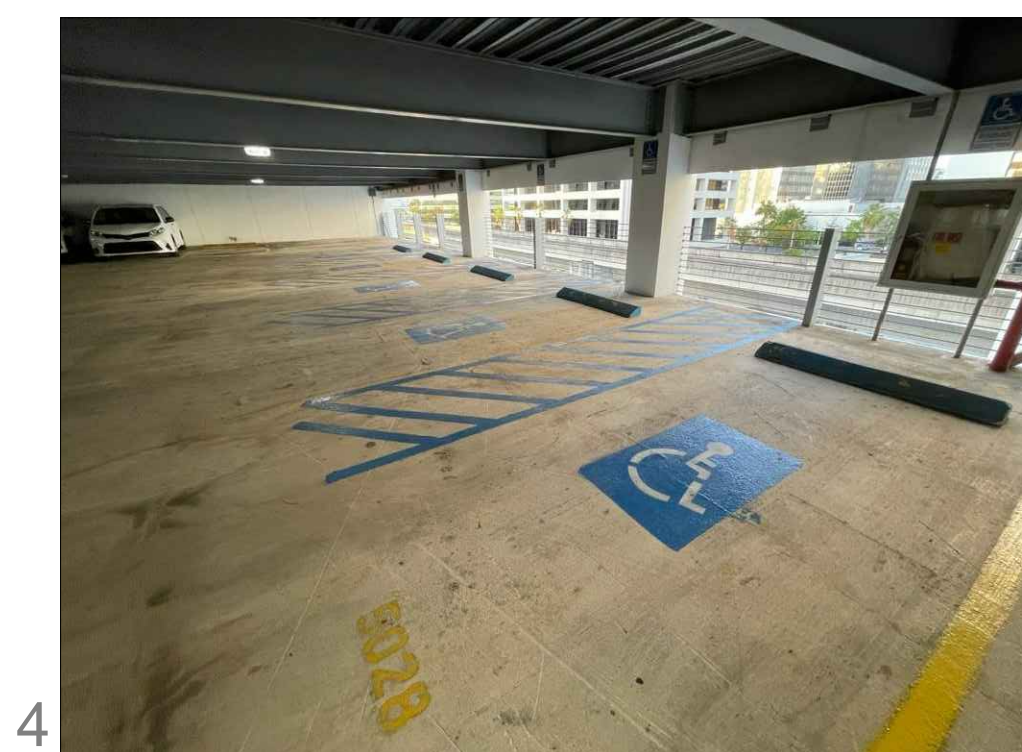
EXISTING TYPICAL ADA LAYOUT
